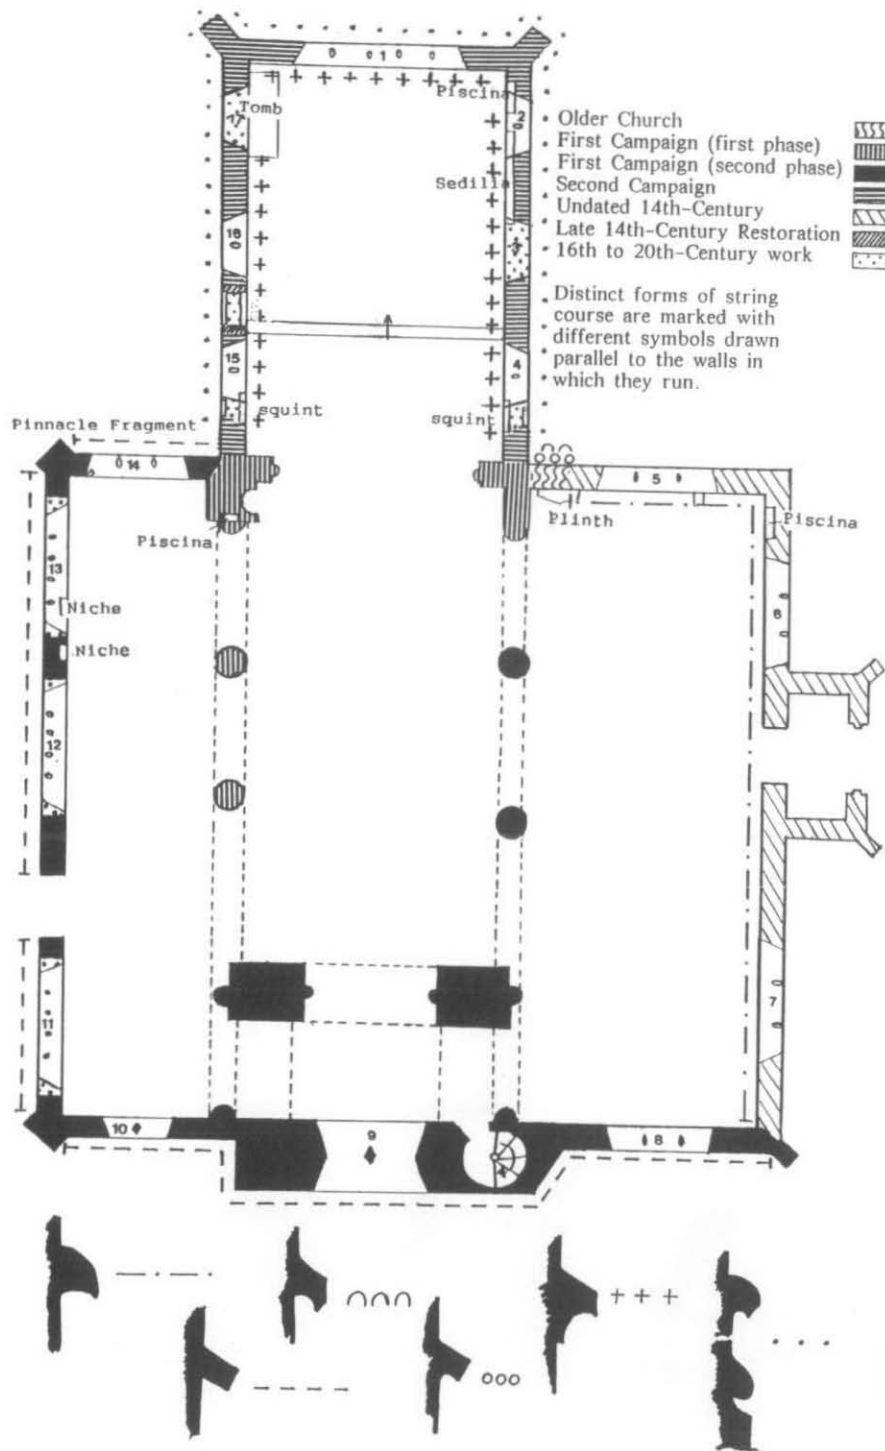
St. Peter's church, Hanwell: plan. Not to scale.
